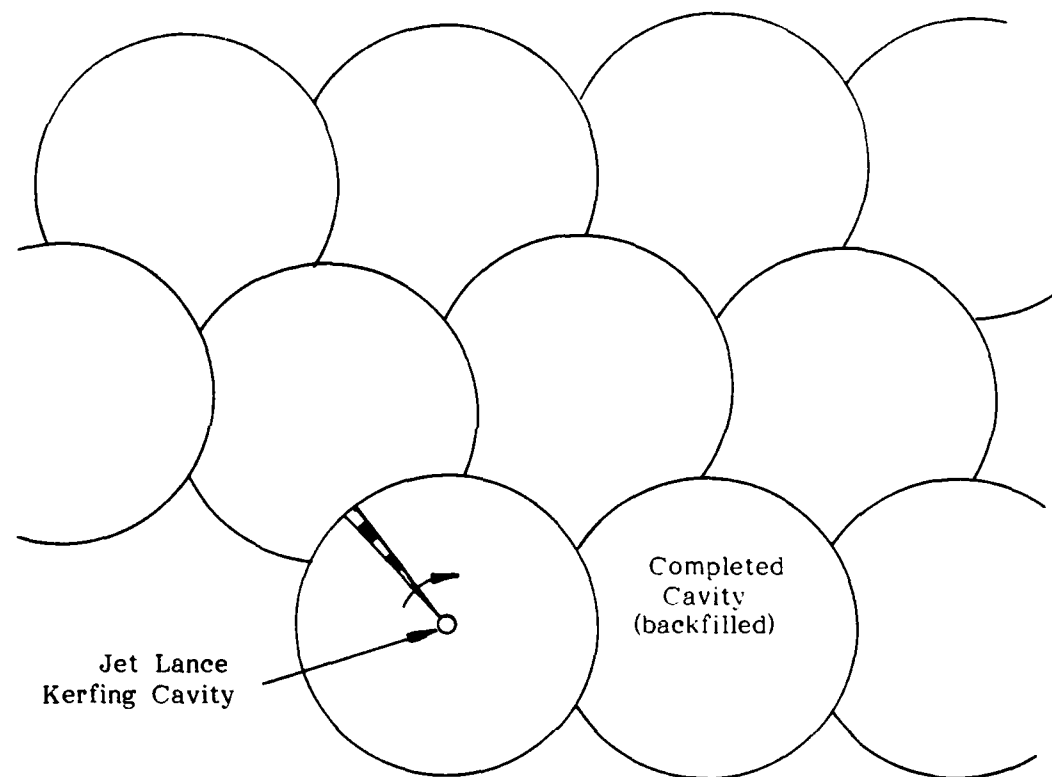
Procedure for "Pancake" Jetting to Place an Impermeable Floor Under a Waste Site (Huck et al., 1980)
